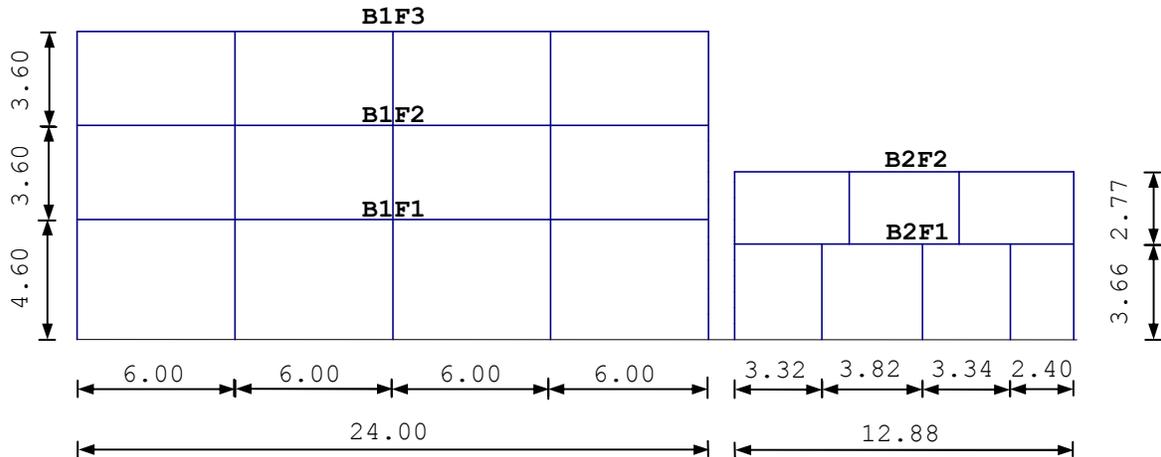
Building layout (floors are labeled first by building number followed by floor number)
